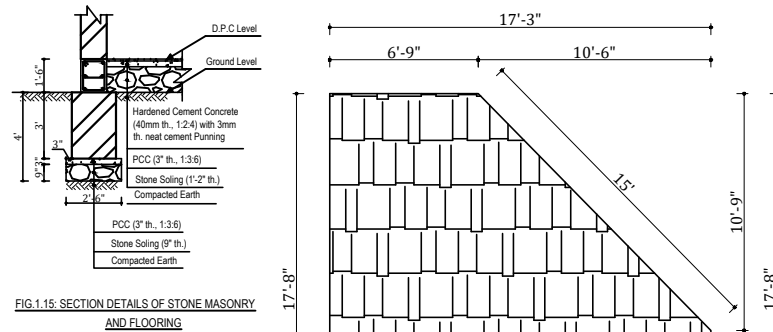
SECTION DETAILS OF STONE MASONRY AND FLOORING
